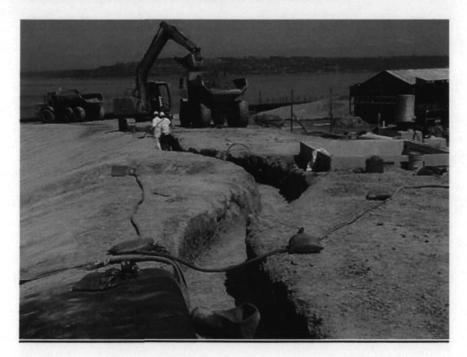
excavation of anchor trench for bottom liner near Vault #1.
